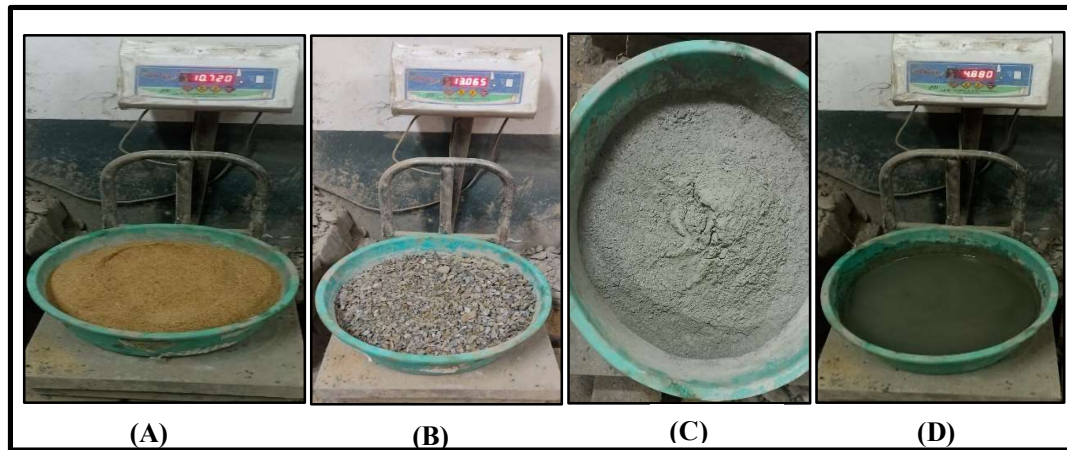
Casting of Plain Cement Concrete Cubes (A) Sand (B) Stone Chips (C) Cement (D) Water
